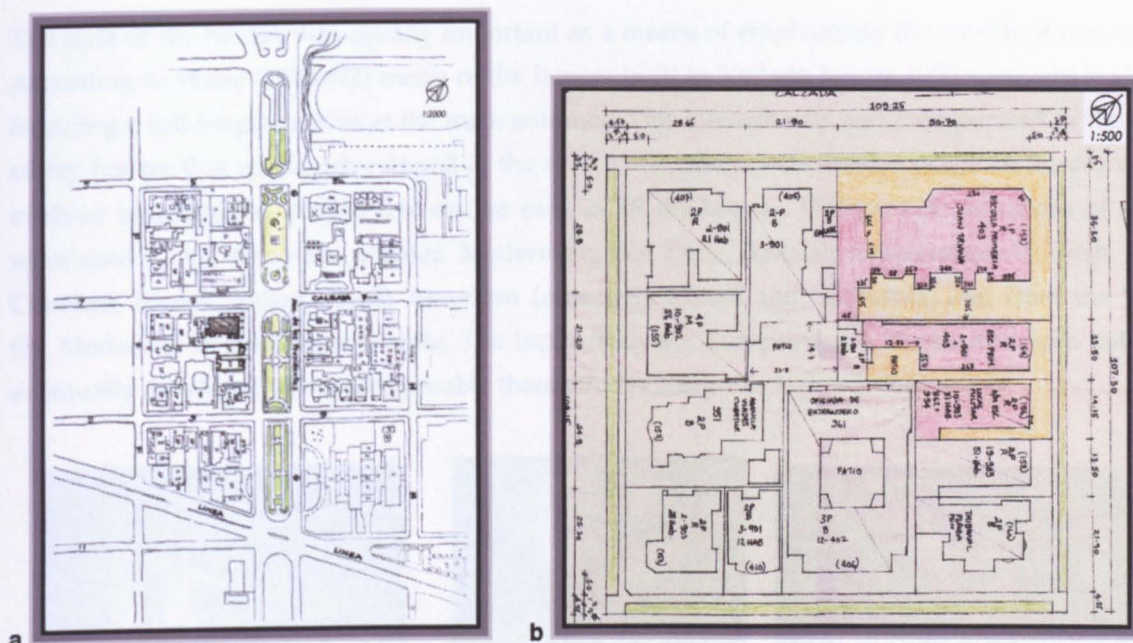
a) Location Plan and b) Plan of a Typical “Manzana” - School No.2.16 Juan Triana
